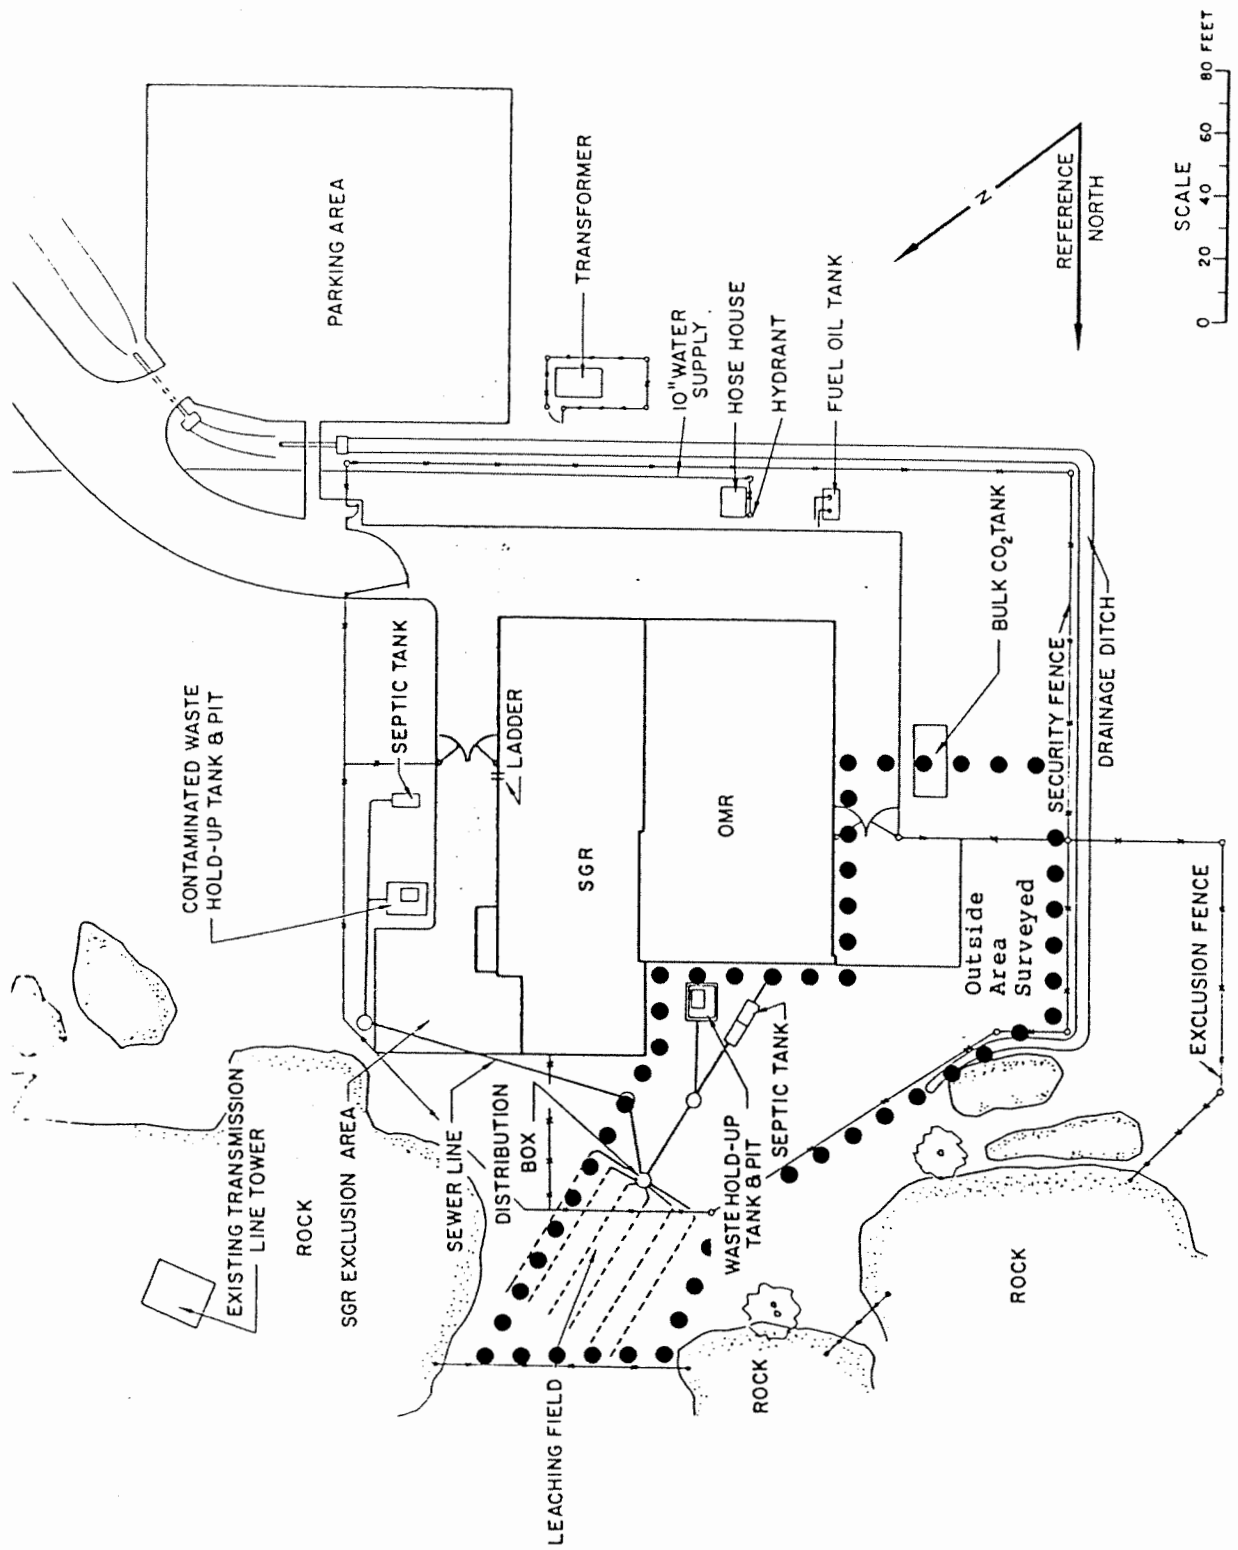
Plot Plan of Building T009, Showing SGR and OMR Test Rooms
